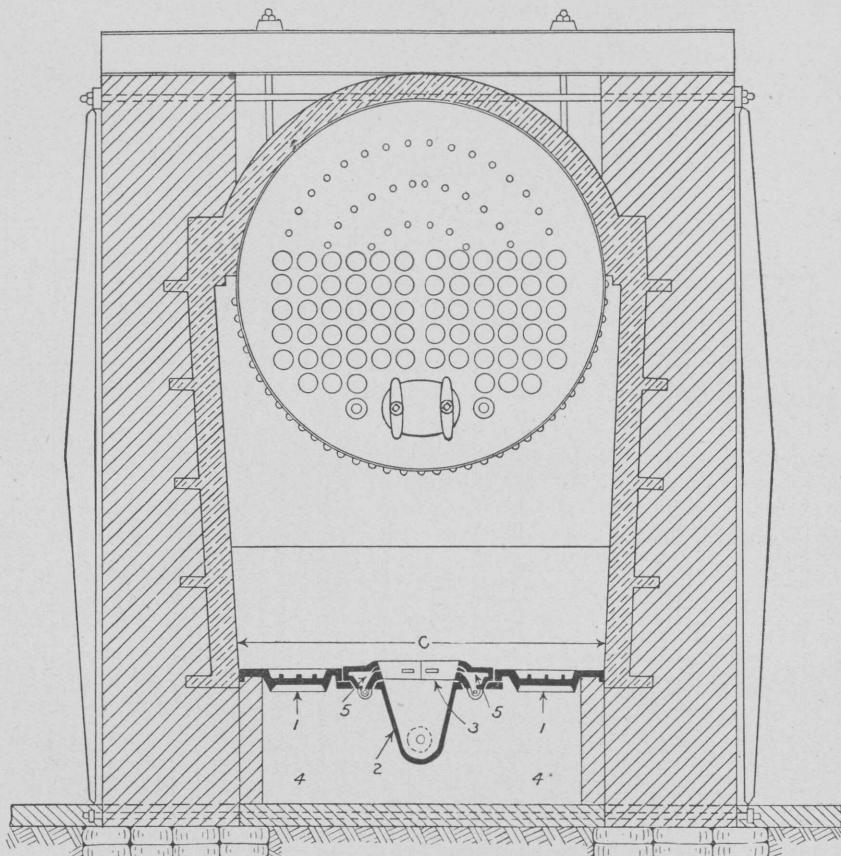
Underfeed stoker and return tubular boiler, cross section. 1, Dead plates; 2, retort; 3, tuyère blocks; 4, air chamber; 5, space through which air passes before entering retort.
